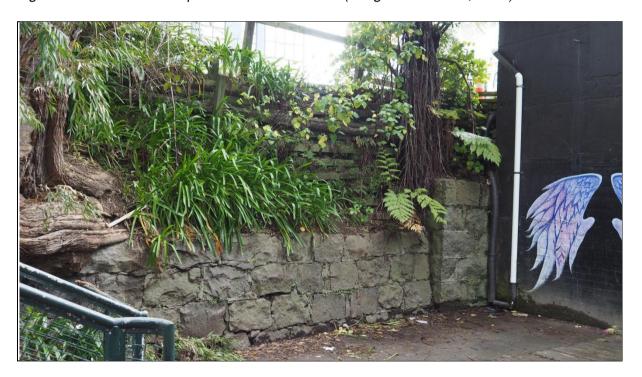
Remnant section of stone railway embankment, retained eastern boundary of project area above (Image: Ivan Bruce, 2019).
